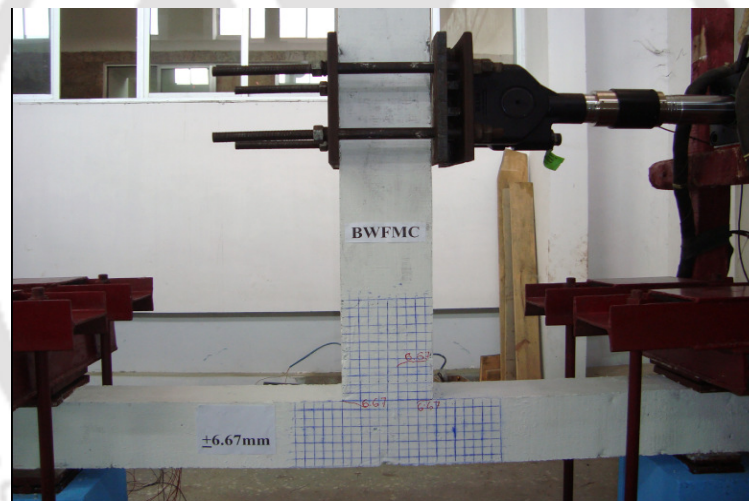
Appearance of first cracks in BWFMC specimen
